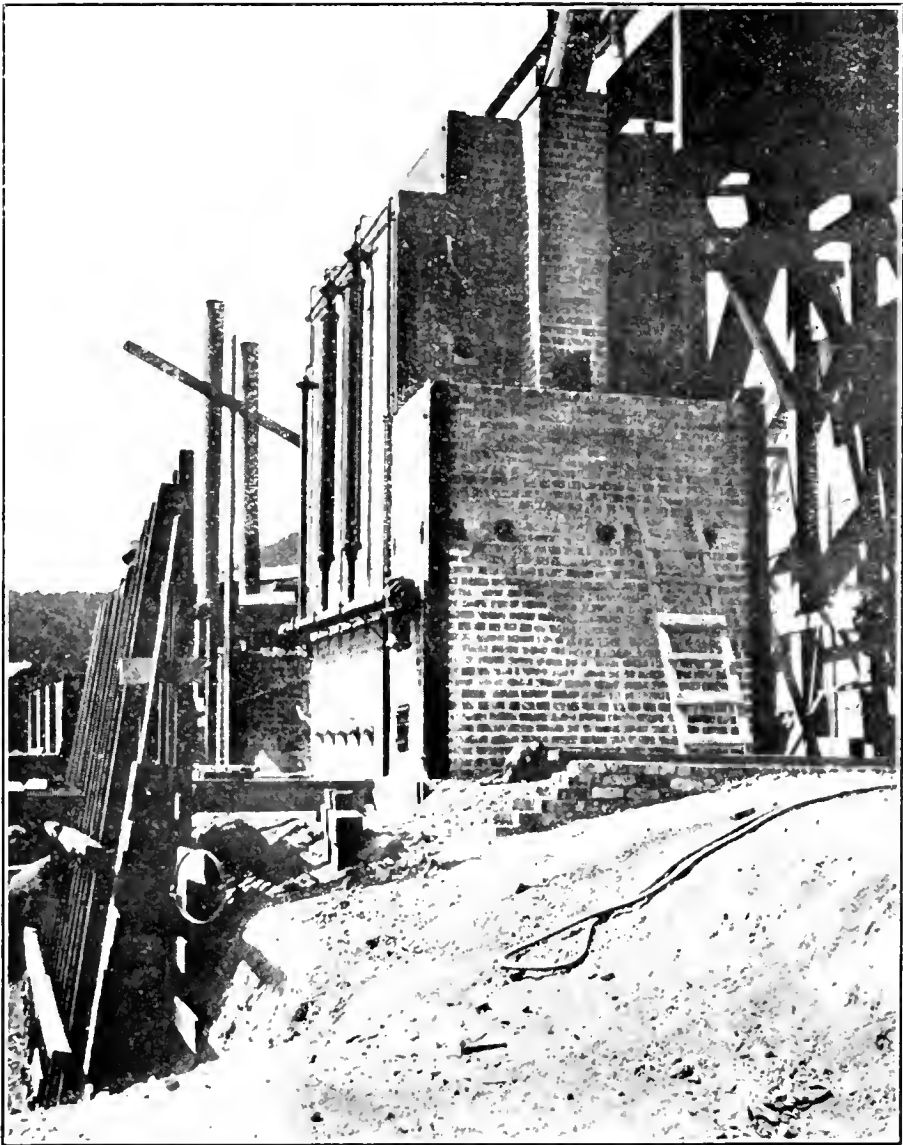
Livingston Furnace under construction at La Joya Mine, Napa County.
